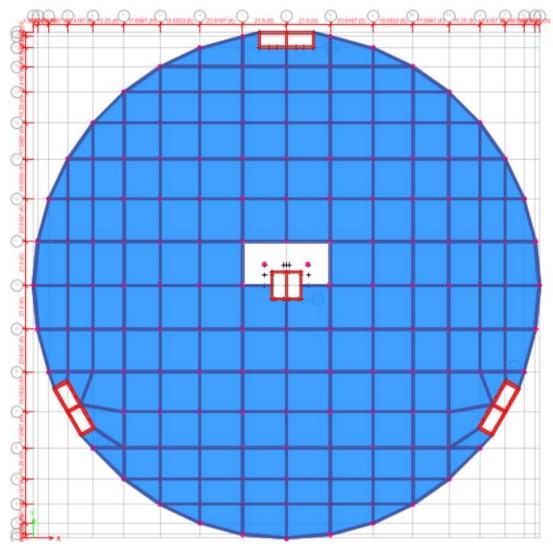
(b): 1st Floor Plan View of Braced Structure
